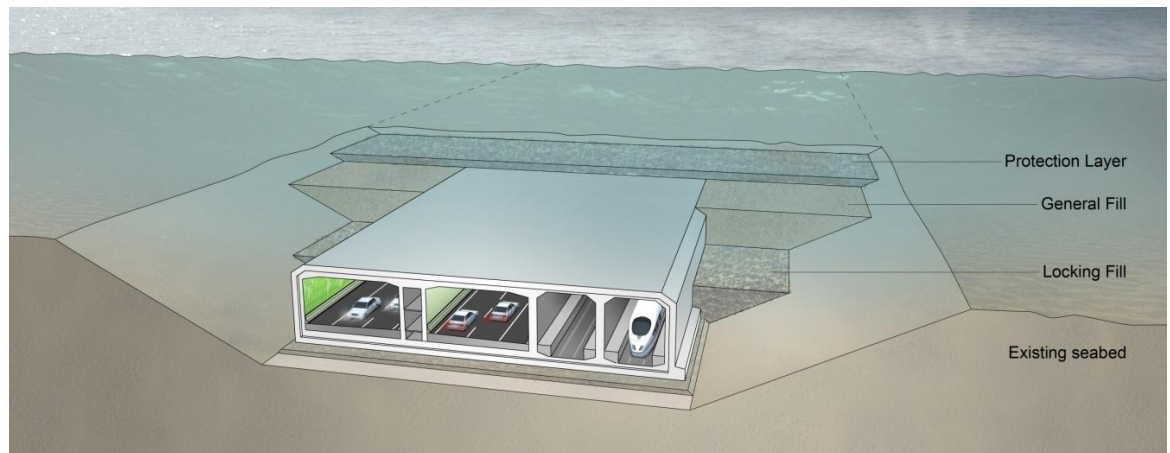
Cross section of dredged trench with tunnel element and backfilling
